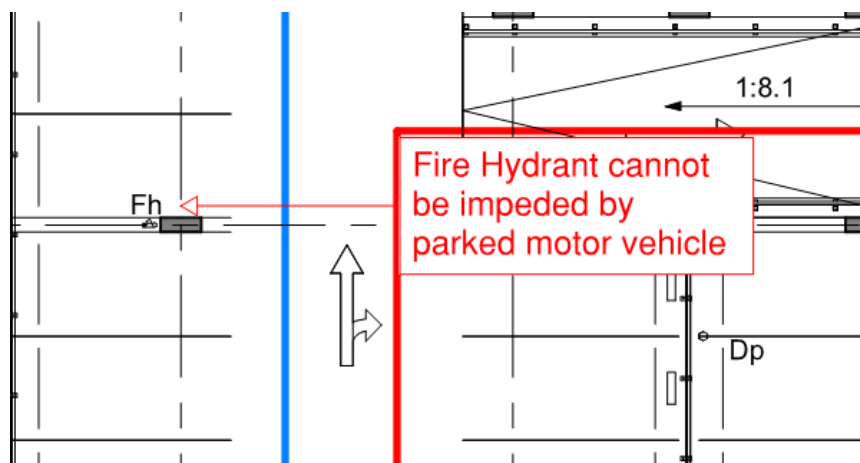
Internal on floor fire hydrants to have unimpeded access can cannot be block by parked moto vehicles
